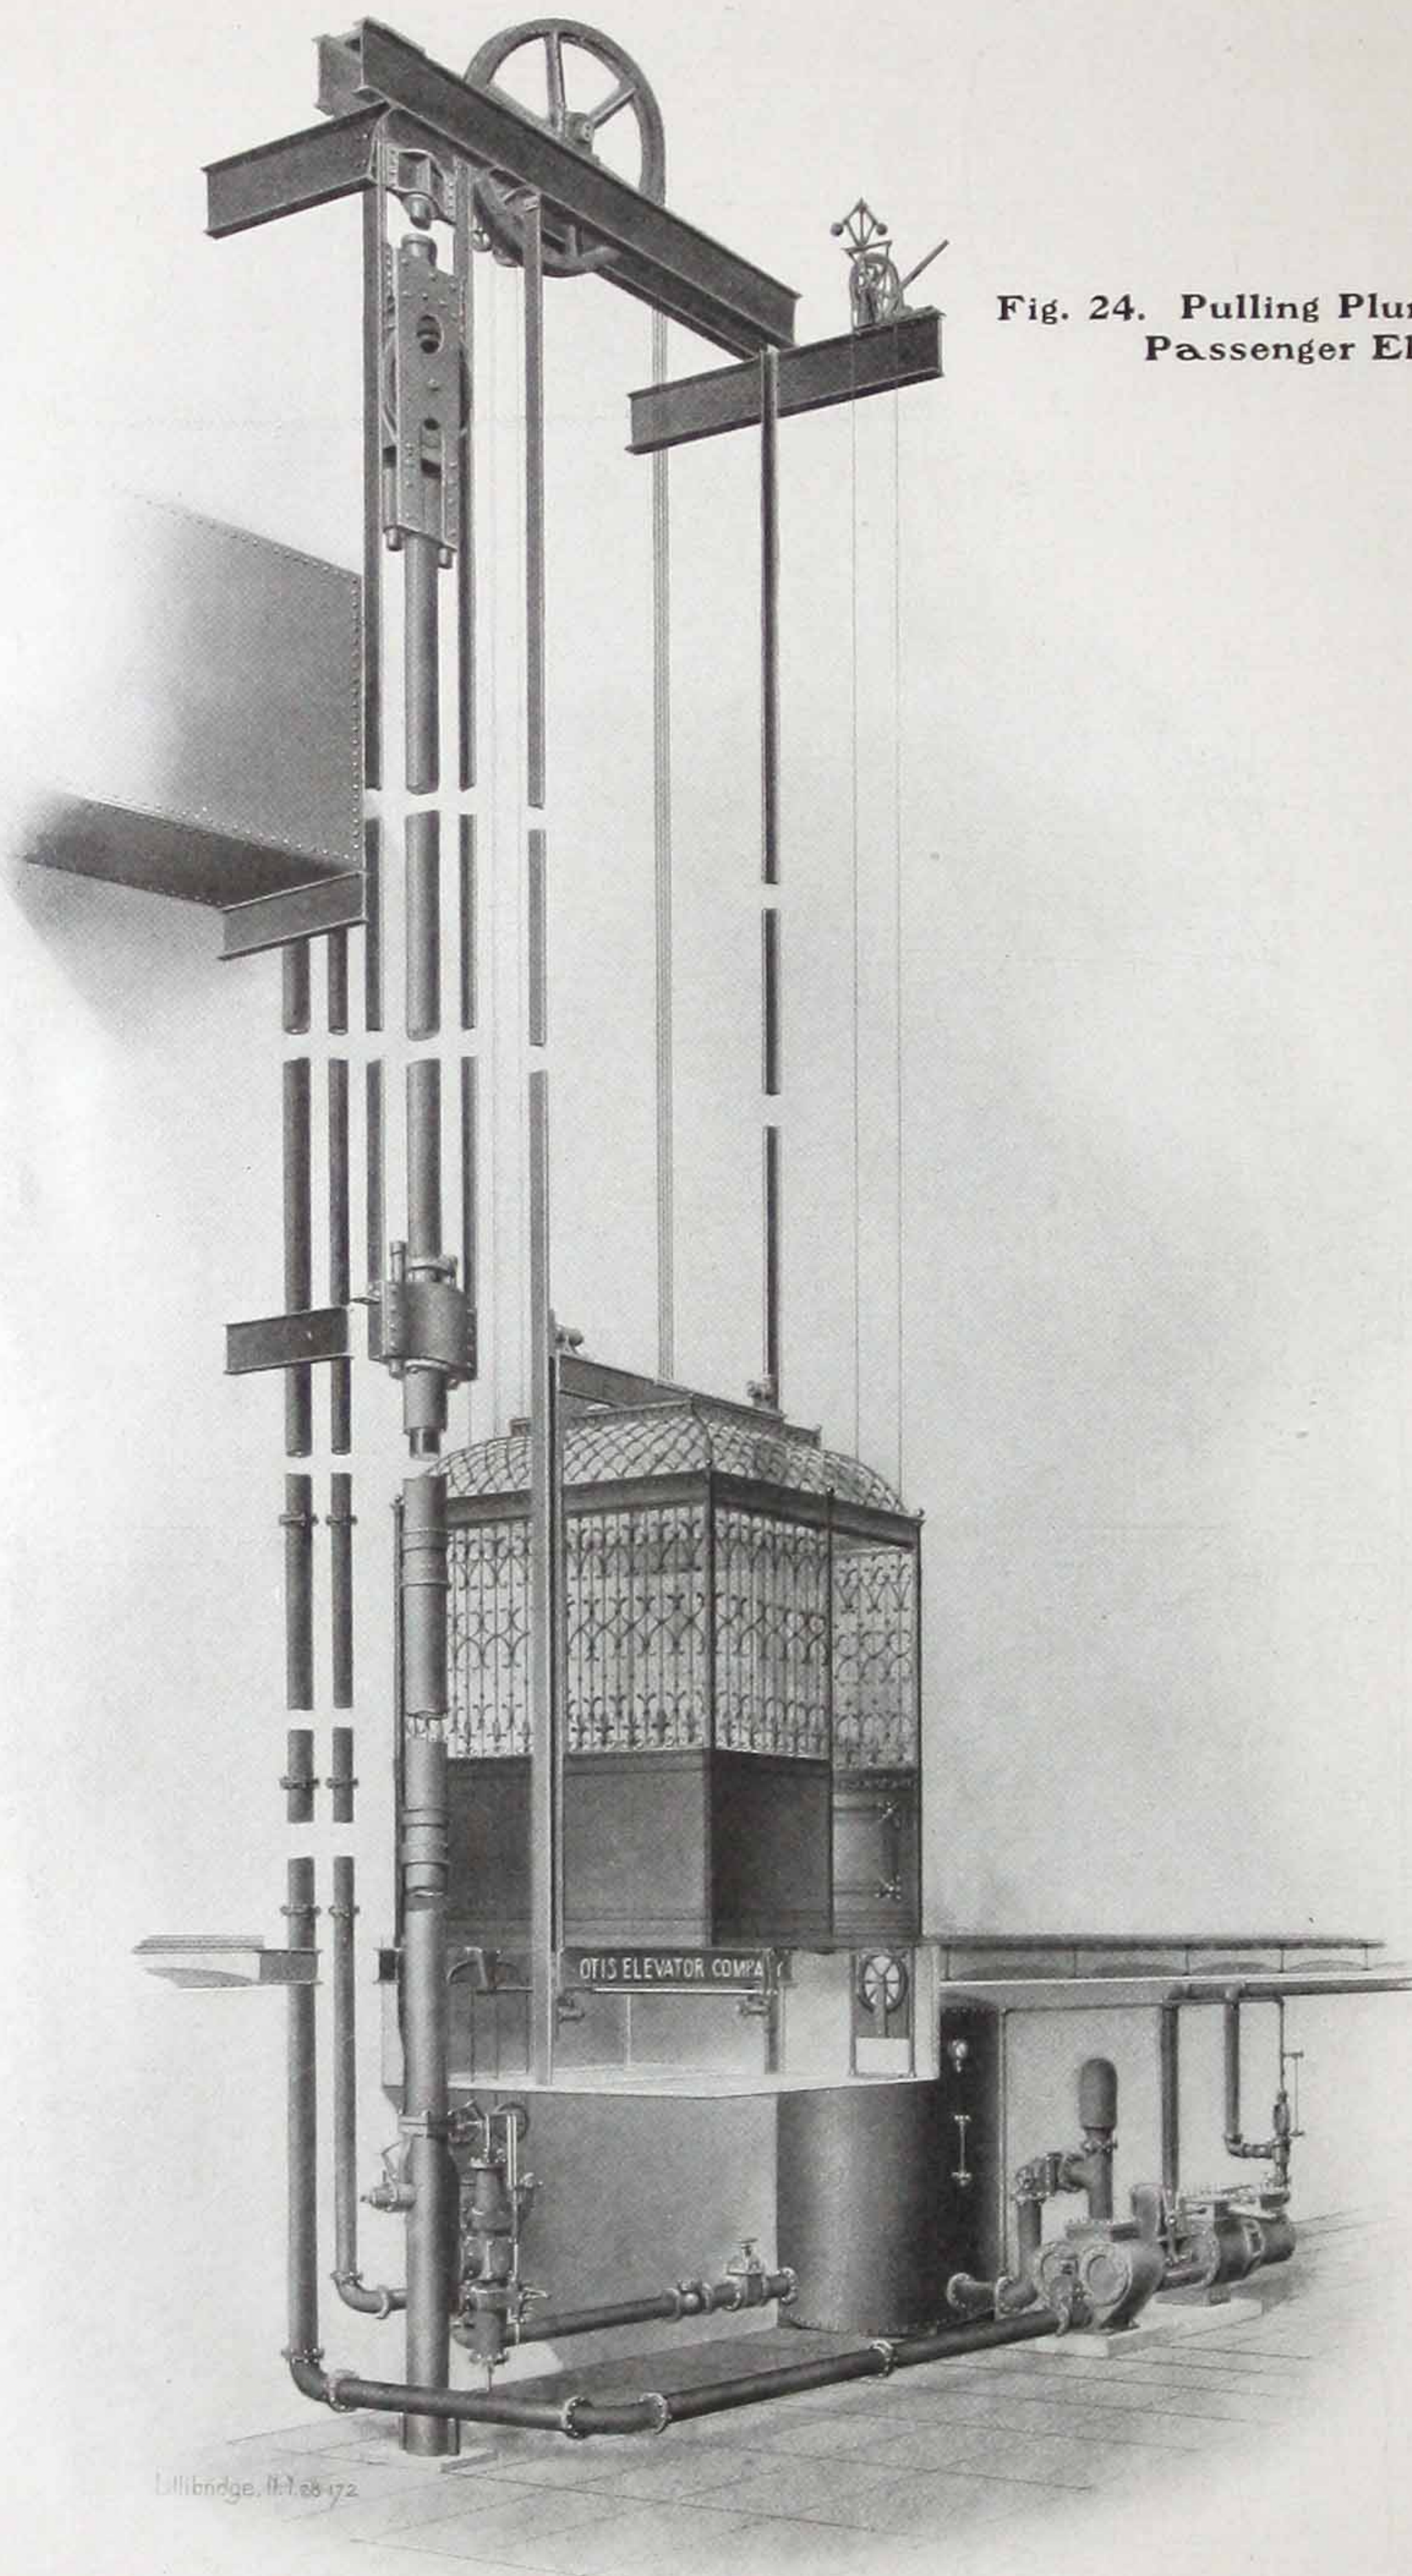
Pulling Plunger Hydraulic Passenger Elevator
